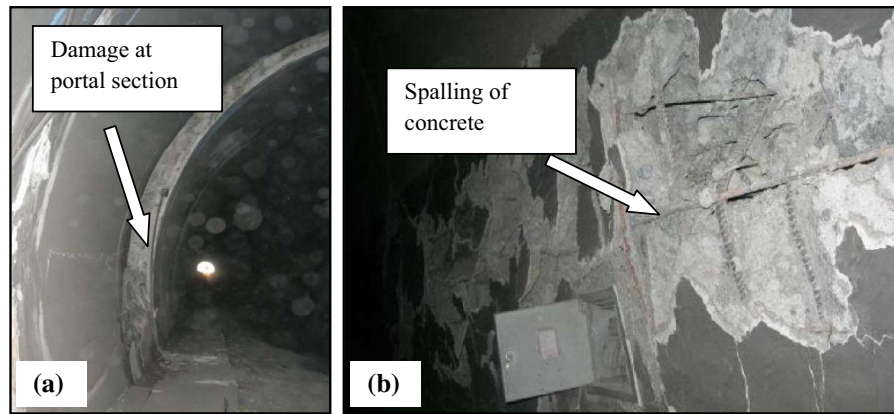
Damages at Youyi tunnel (modified after Tao et al. 2011): a damage at portal section, b spalling of concrete from tunnel lining
